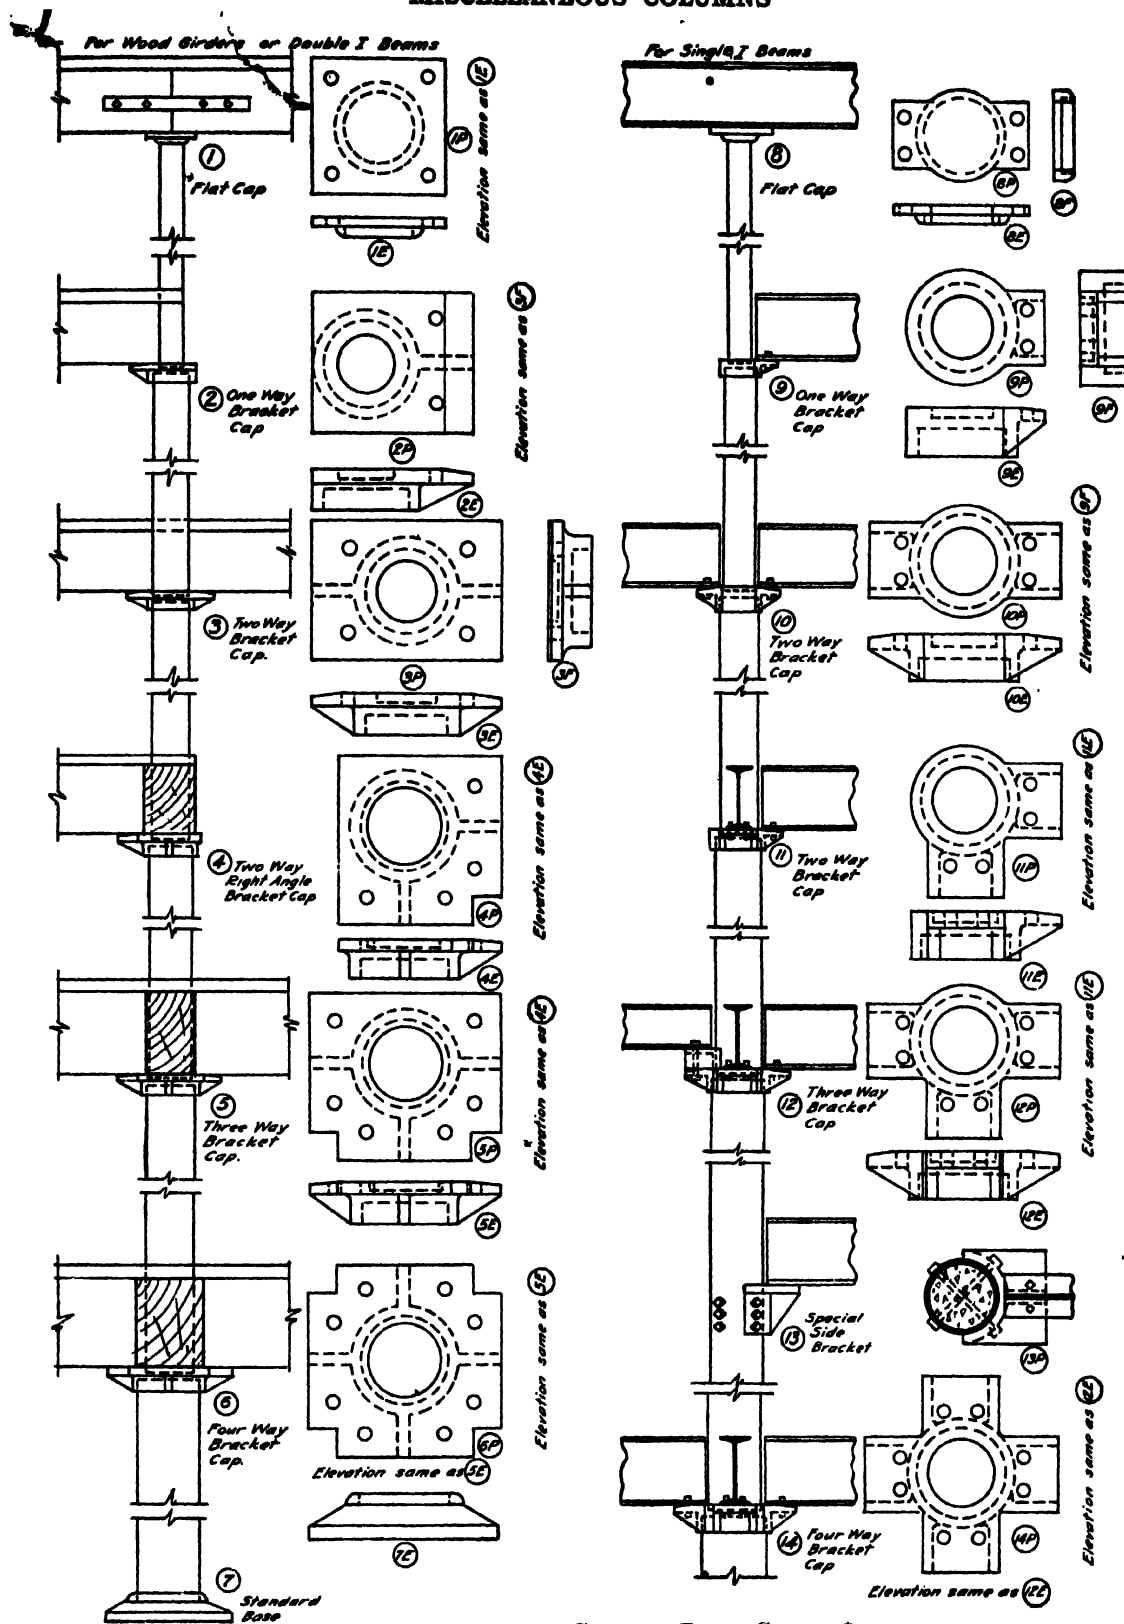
DETAILS FOR CONCRETE FILLED COLUMNS\
